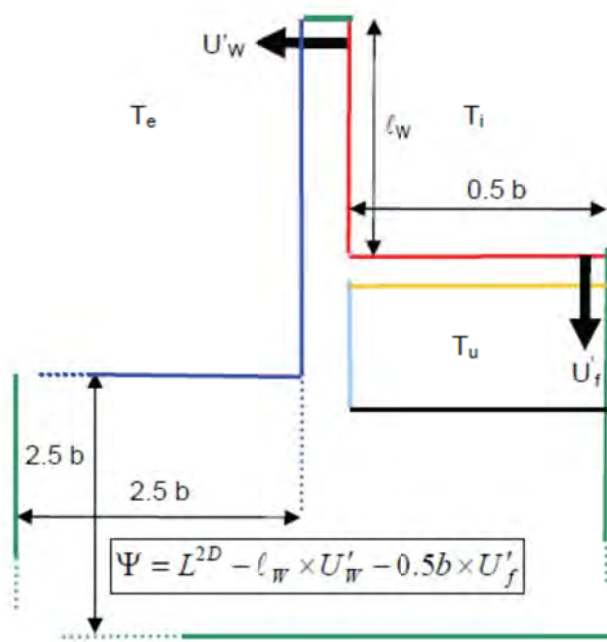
Conceptual approach of calculating thermal bridge at junction between suspended floor and wall (Ward and Sanders, 2007)
